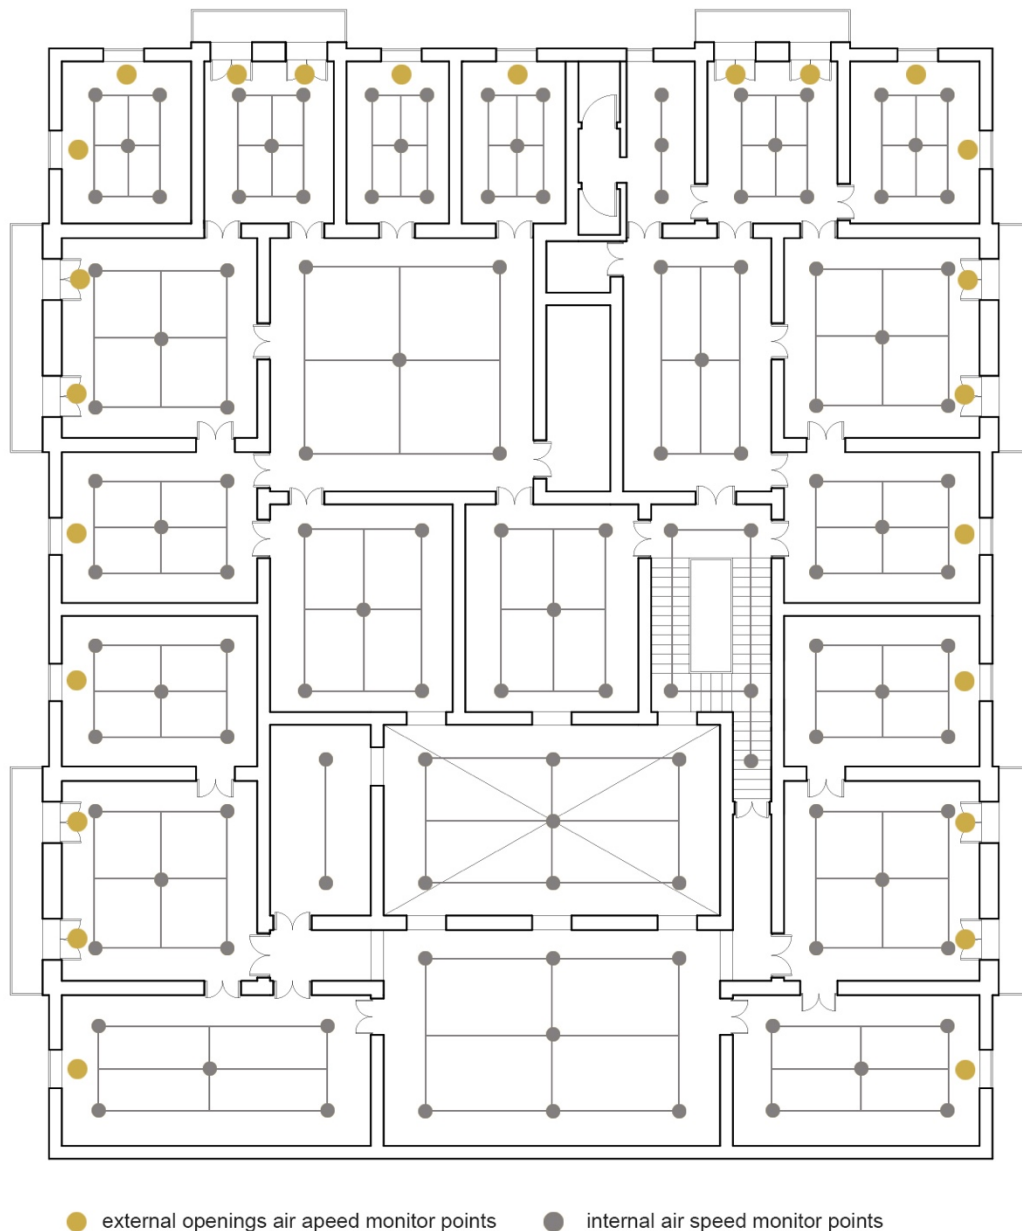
case study detailed floor plan highlighting the monitoring points
